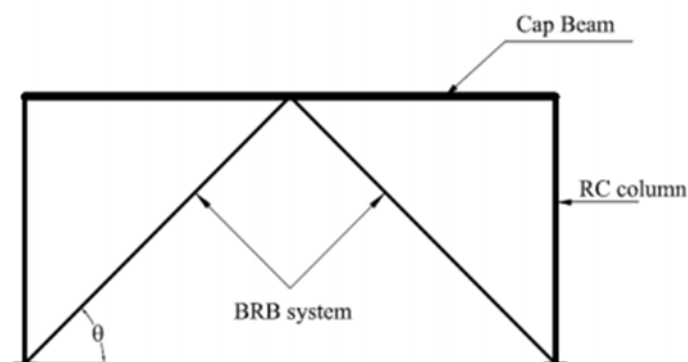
Layout of BRB Retrofit Scheme (El-Bahey and Bruneau, 2010)
